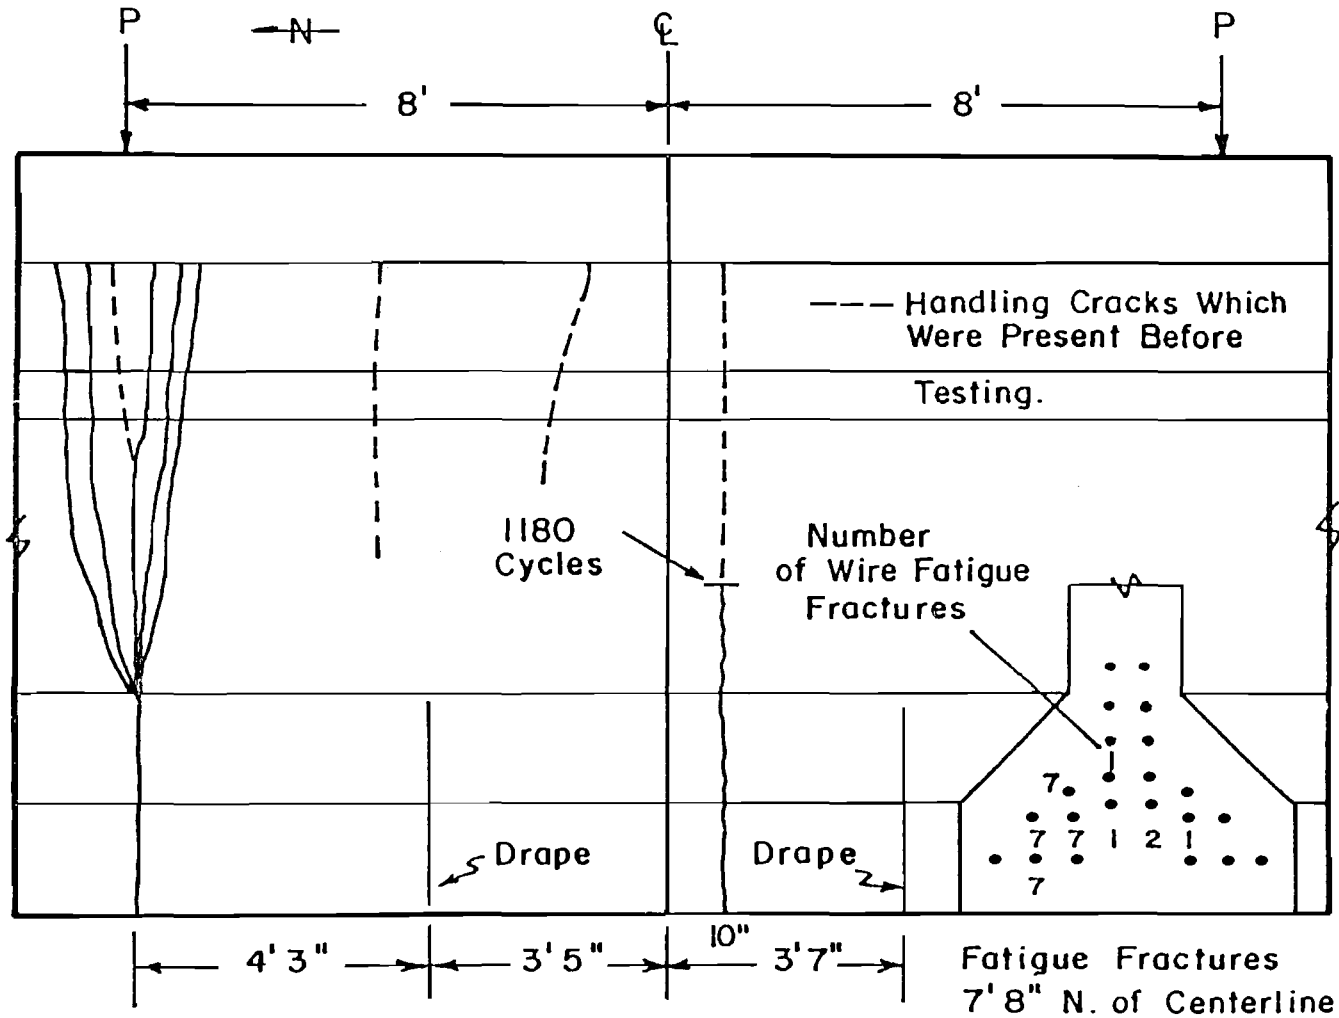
Location of drape points and fatigue fractures for Specimen A-22-NP-6.2-NO-5.00
